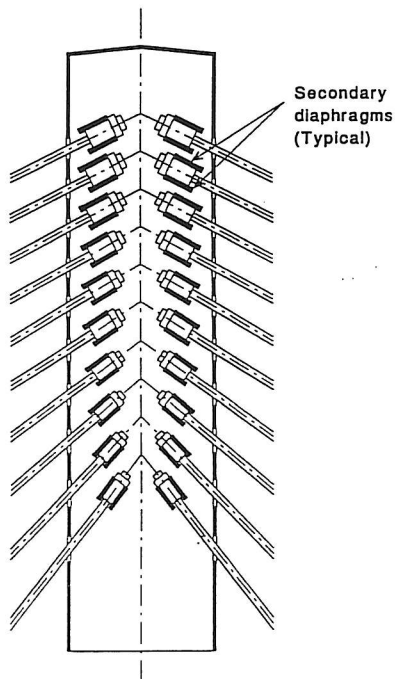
Anchorage system for cables at pylon in a modified fan bridge
